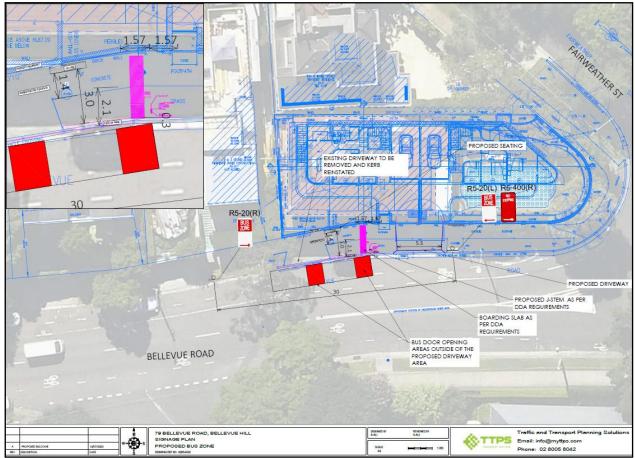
Plan showing proposed driveway and bus stop. Source: Submitted Traffic Report
